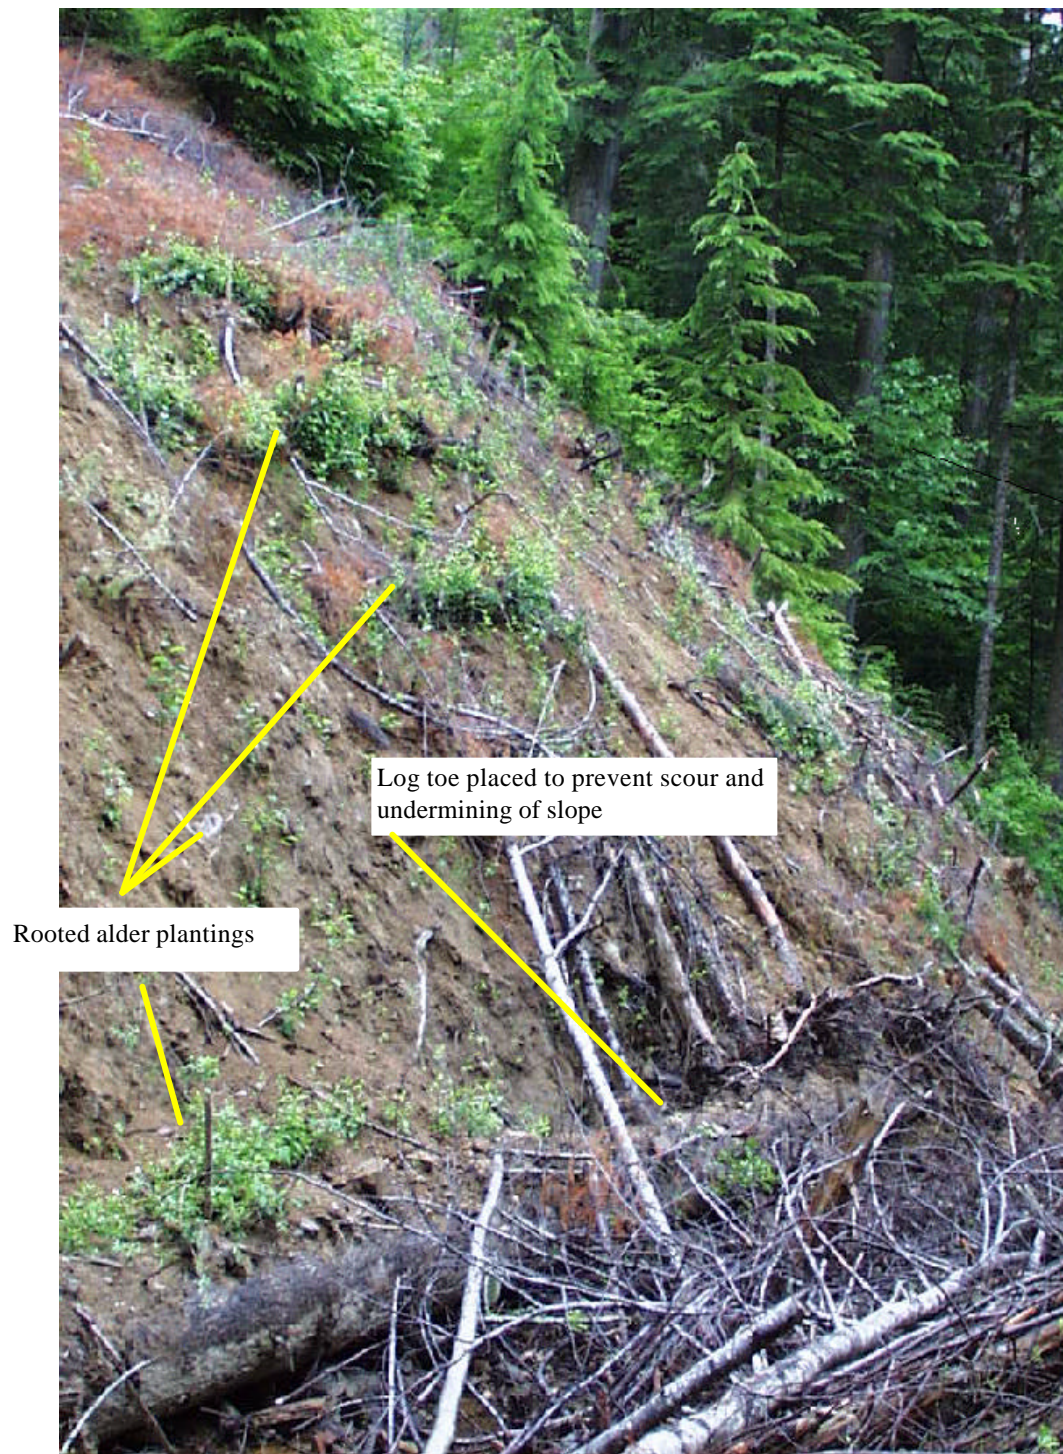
Toe stabilization of a culvert removal site on a tributary to Dry Creek, Skamania County, Washington.
